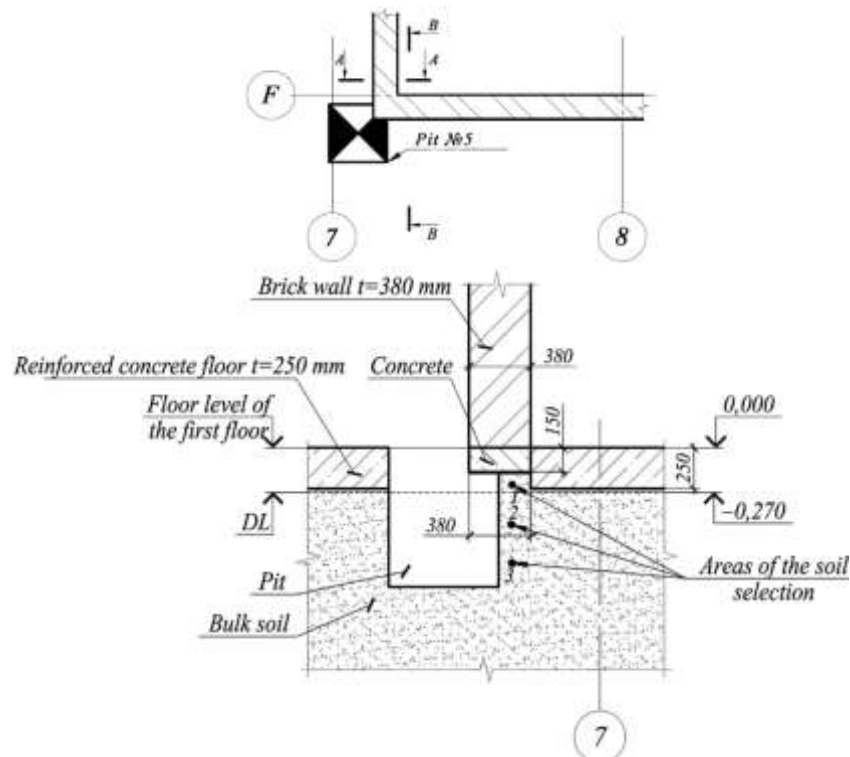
Scheme of the layout of the pit No. 5 and section A–A
